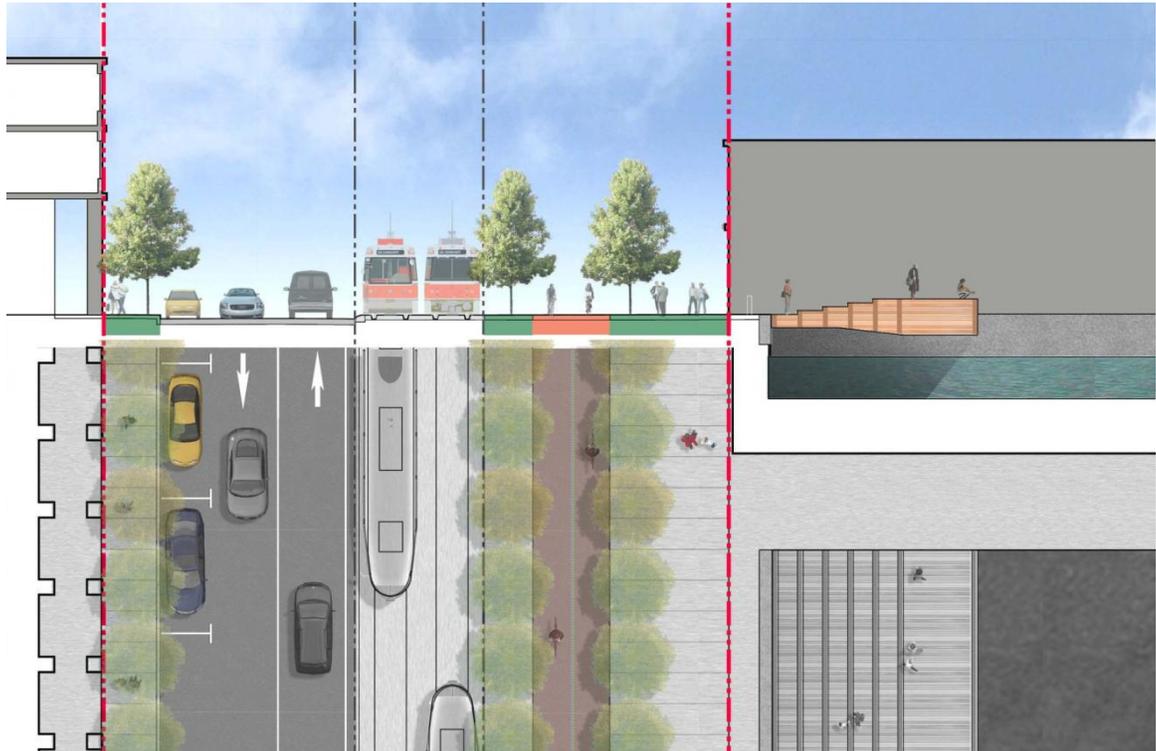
Typical Section and Plan of Alternative 4 Southside Transit with One-way Traffic Operations
